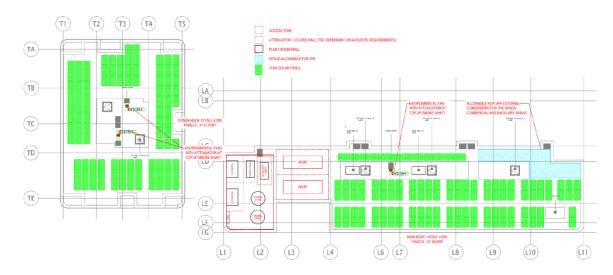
proposed PV layout at roof level (to be mixed with biosolar roofs)
